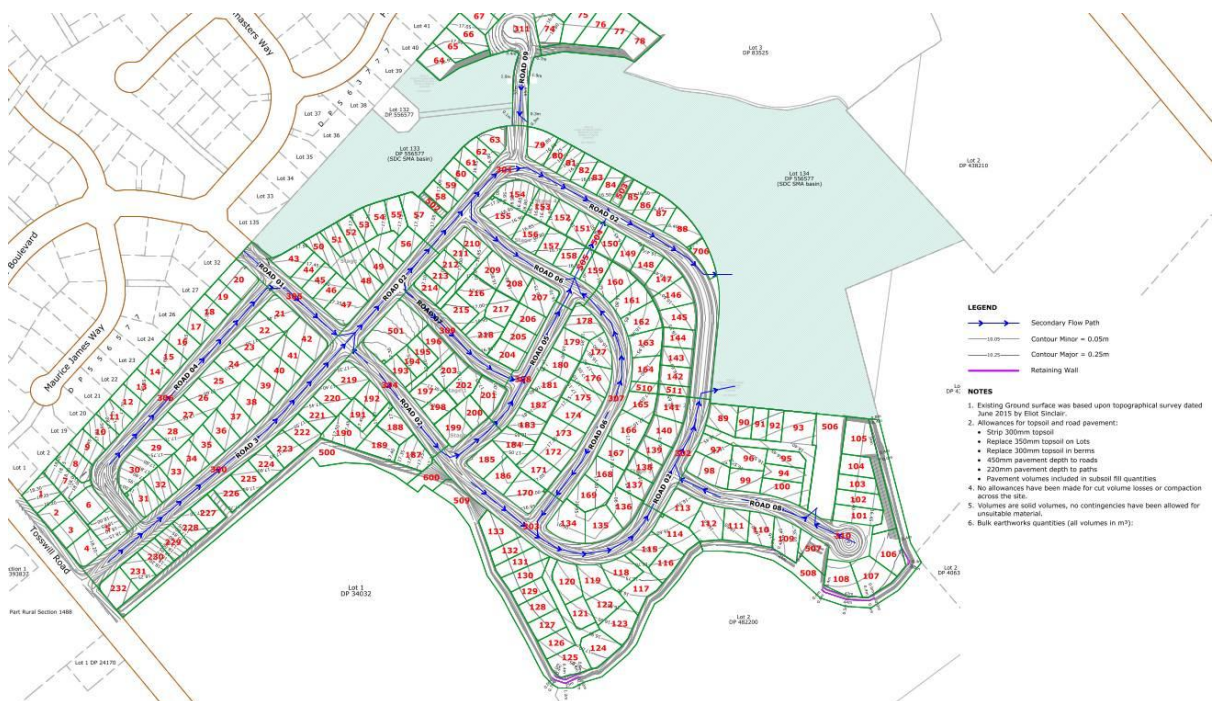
Drawing C1-C102 Revision B dated 17 October 2025 Design Ground Level Contour Plan - Retaining walls show in purple
